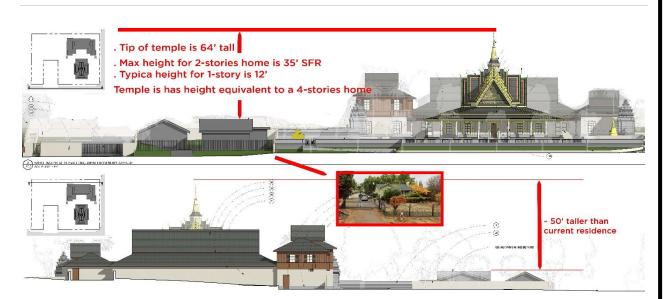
Home directly impacted by MASSIVE Driveway, MASSIVE PARKING LOT, MASSIVE 65 feet Tall Building on 3 Sides
